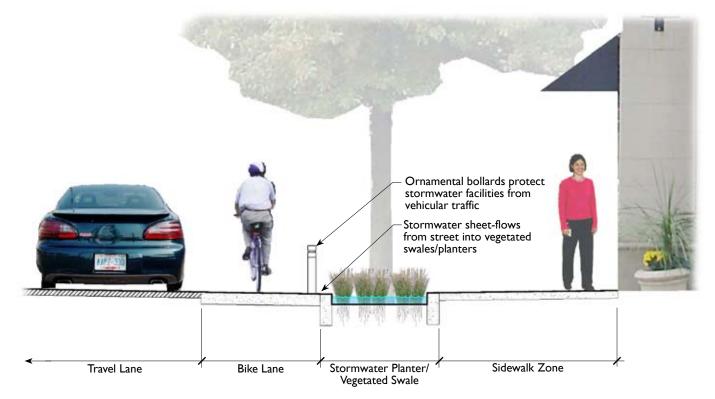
Curbless Street With a Vegetated Swale/Planter on One Side-Cross Section
